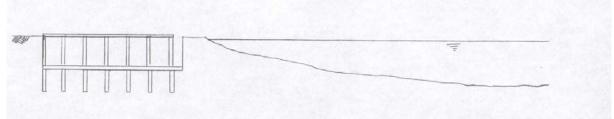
Stage 2: Placing columns on garage floor and placing theatre floor.
